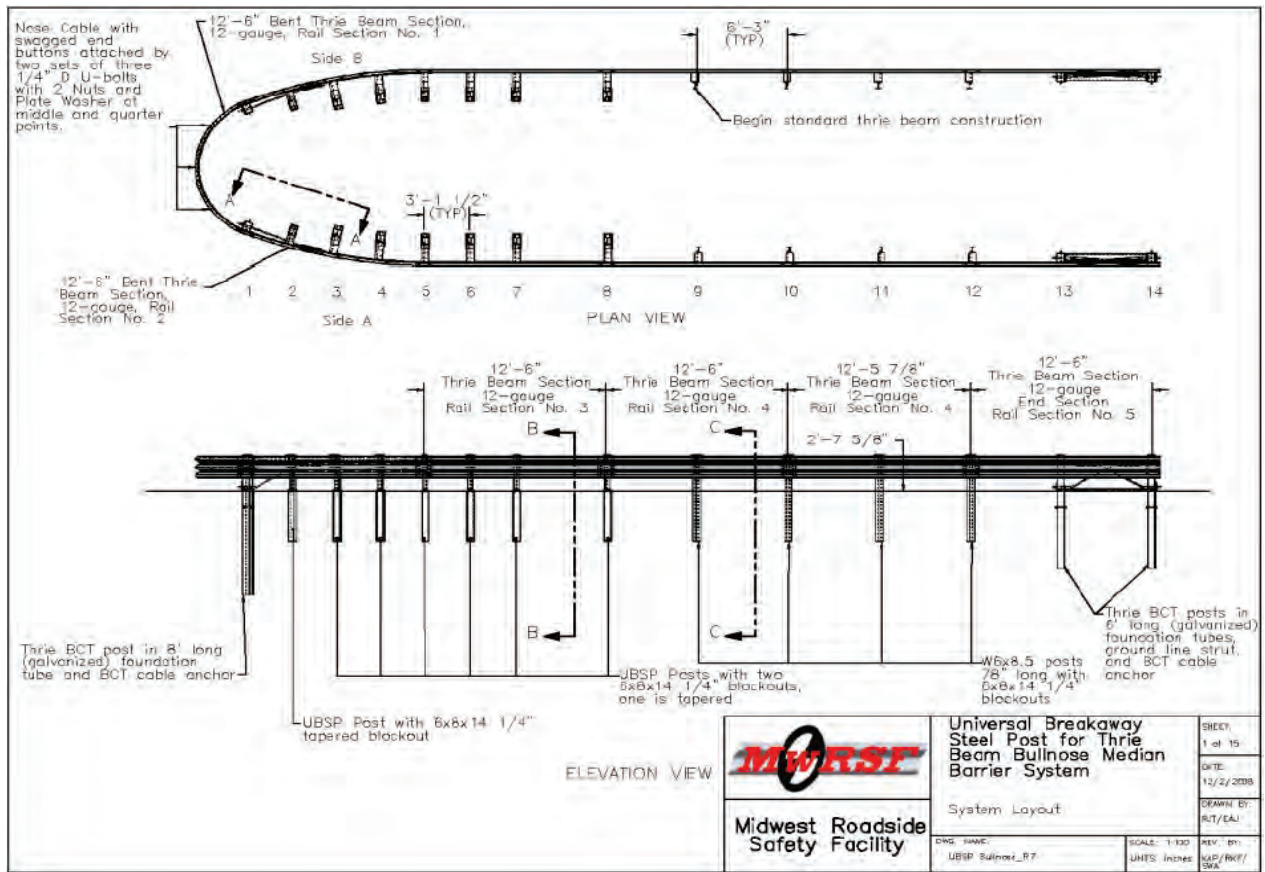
Fracturing Bolt Steel Post Design (13).
